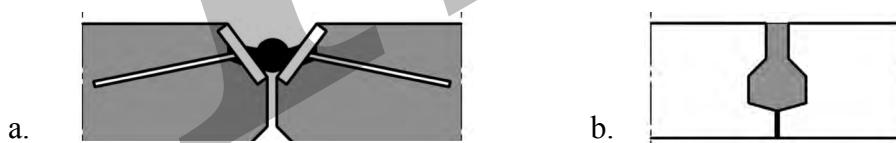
Welded and grouted connections between double-T floor elements
